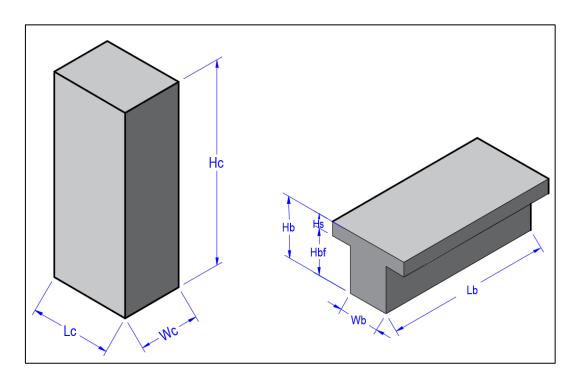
Sketch of the basis of the volume calculation for column formwork (left) and beam formwork (right)
